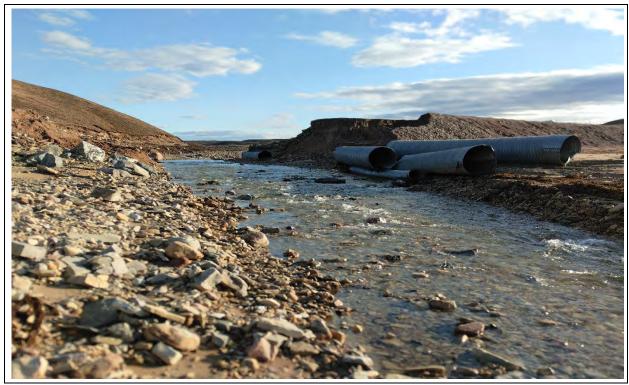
KM 63.5, downstream, looking northeast at crossing, 2024-09-24
